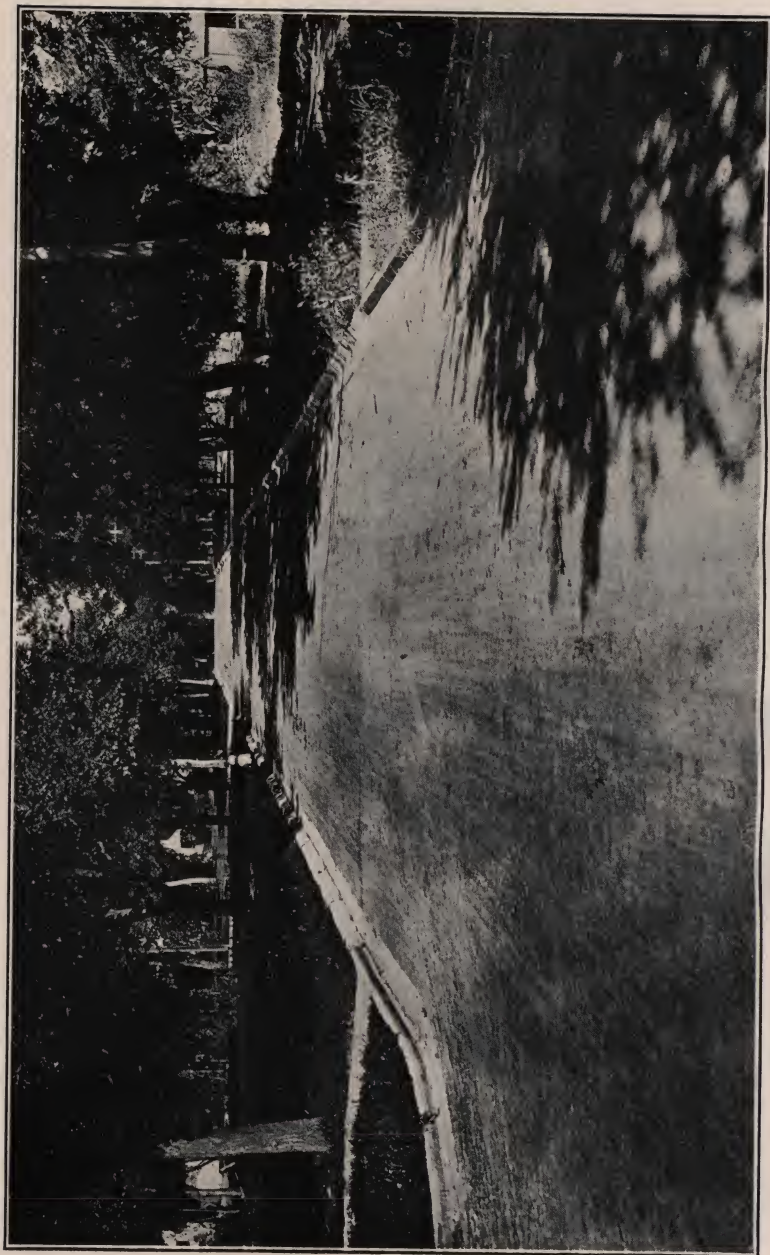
A Satisfactory Division of Pavement, Tree and Sidewalk Spaces.
